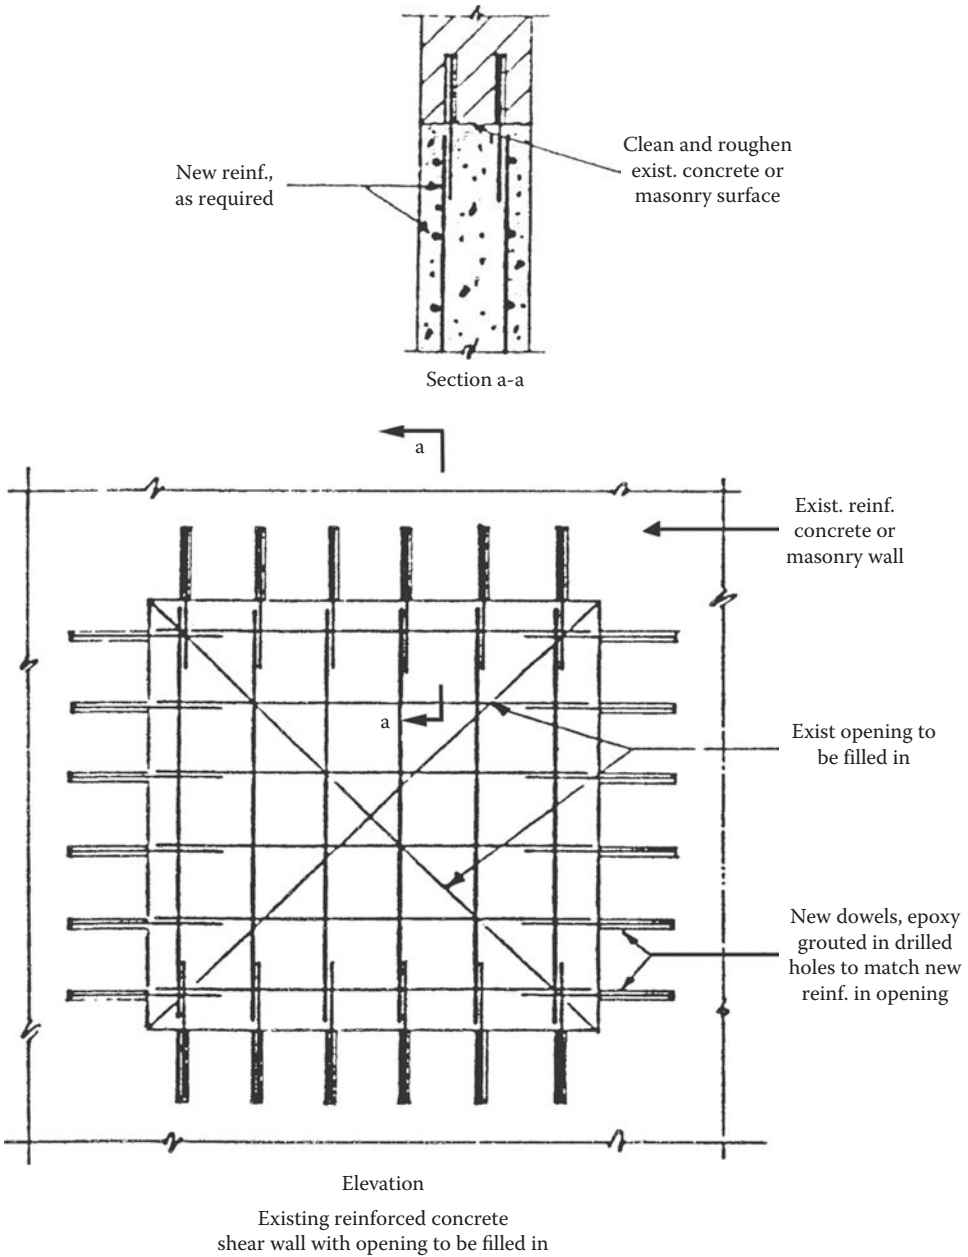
Strengthening of existing reinforced concrete walls by filling in openings.
